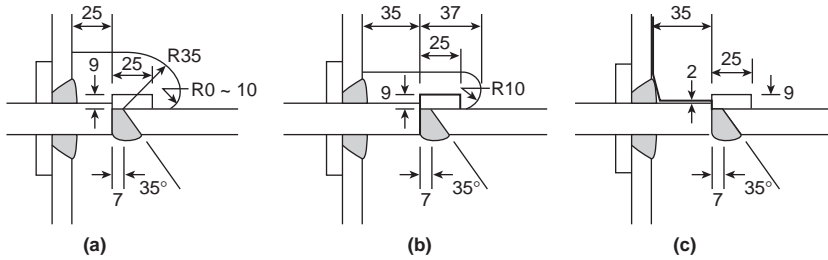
Weld access hole: (a) pre-Kobe standard detail; (b) post-Kobe modified detail with smaller hole; (c) post-Kobe no-hole detail. (Courtesy of M. Nakashima, Disaster Prevention Research Institute, Kyoto University, Japan.)
